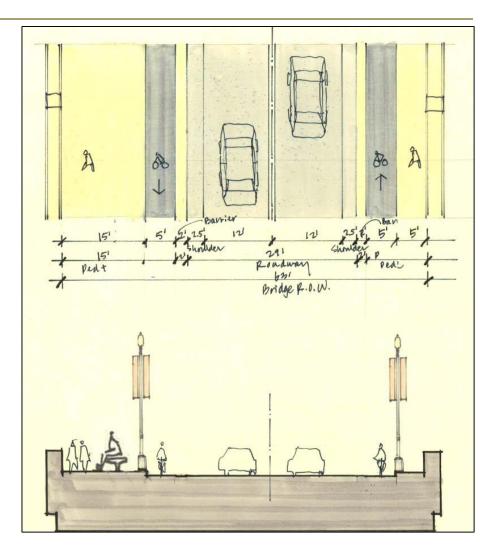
Derby-Shelton Bridge Segment Option 4 Cross Section
